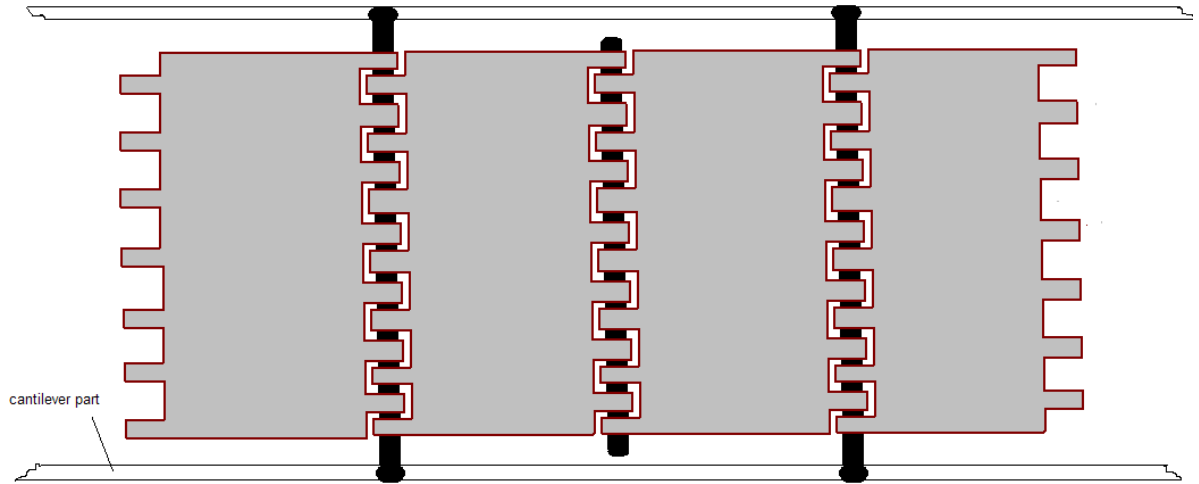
20 Safety Floor element – Mode of folding – hand sketch
